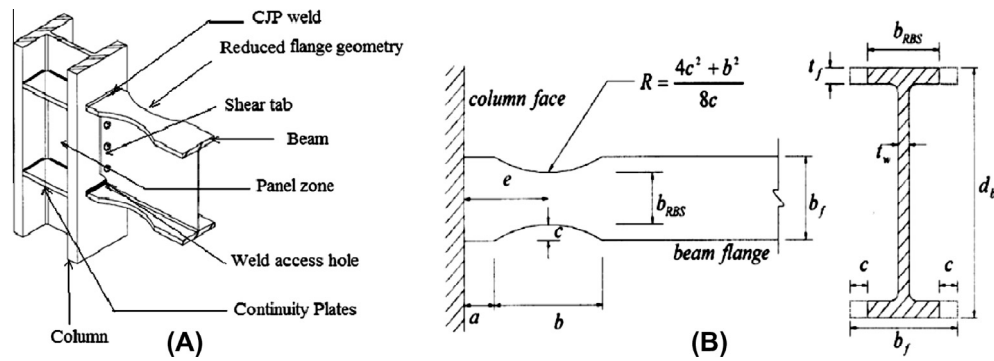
(A) RBS connection detail. (B) Typical geometry details of RBS.
